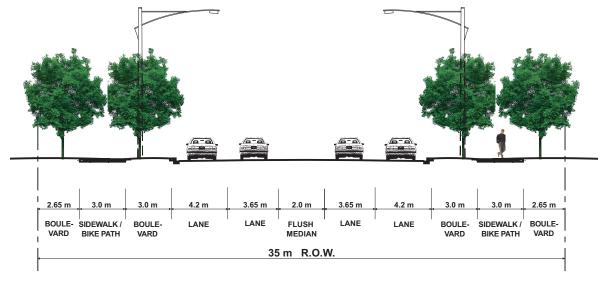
Arterial Road (Tremaine Road (RR 22)) illustrating semi-urban road section adjacent to the Escarpment lands.
